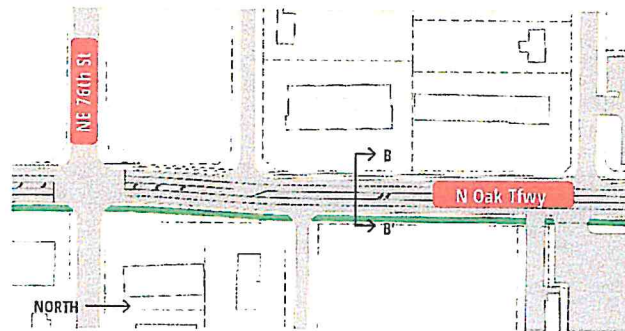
TYPICAL 5-LANE CONFIGURATION - PLAN
